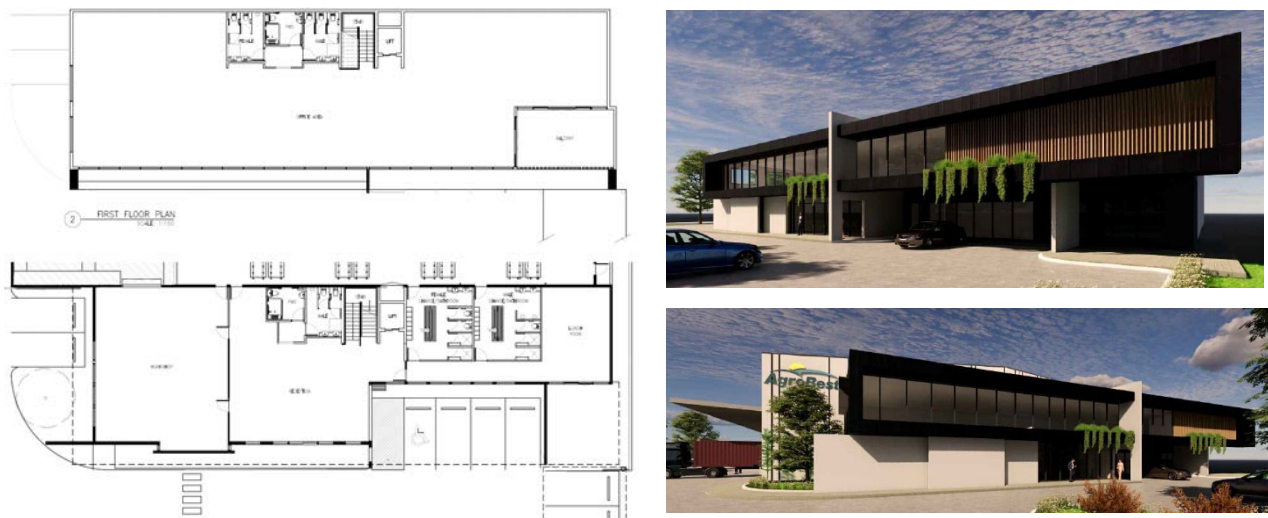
Proposed office floor plan and rendered elevations (GDP file, 2022)
